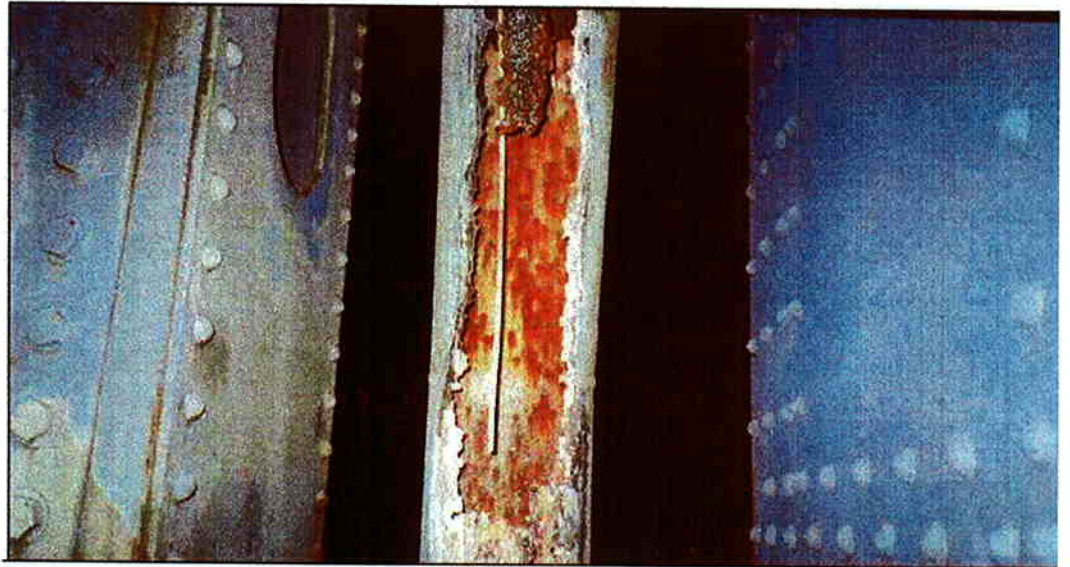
Looking west at drainage conduit next to upper deck floorbeam 0, downstream truss. Note complete section loss through conduit.
